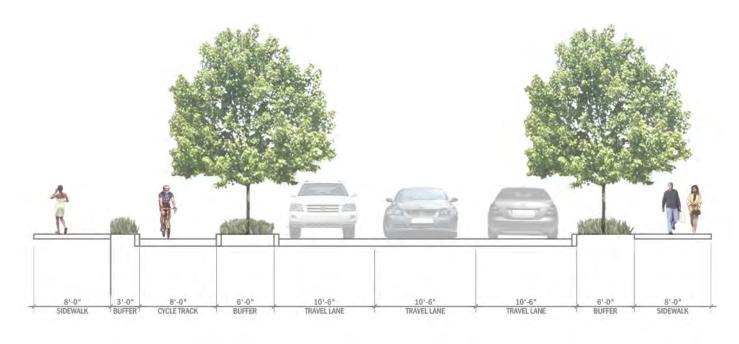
SECTION B: Market Street, at Railroad Crossing between East Ponce and Church Street
